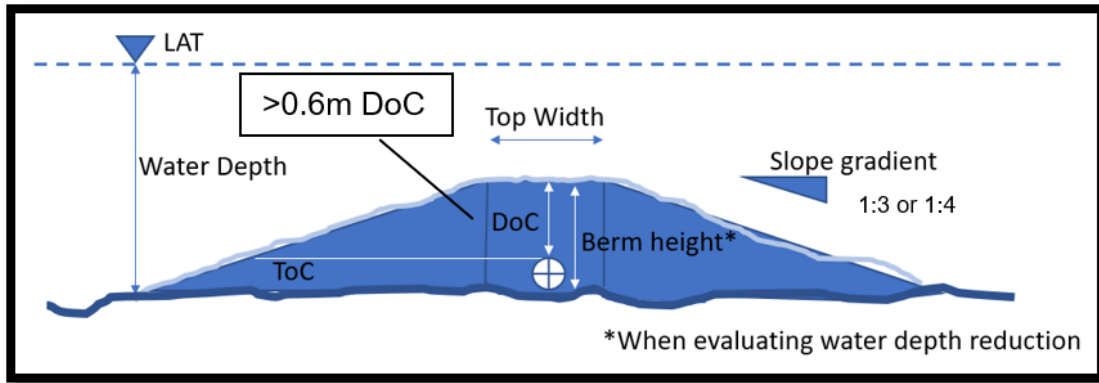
Rock Berm Design for Cable on Seabed (Not to Scale)
